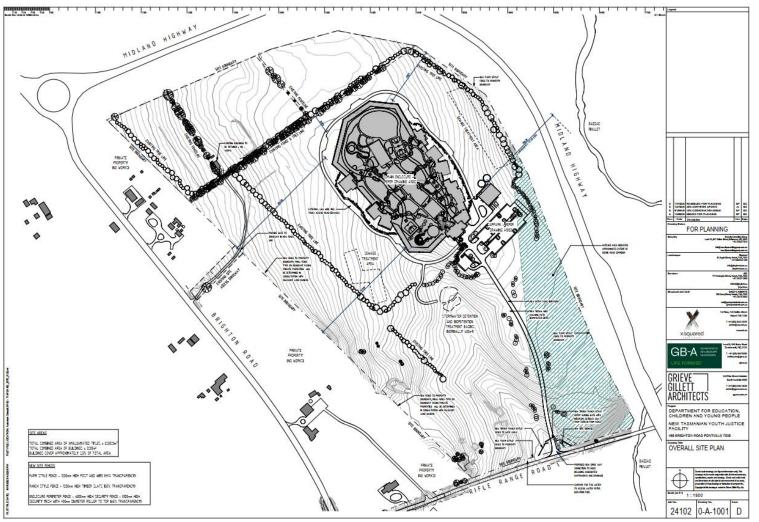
Overall site plan of the proposed development. (source Grieve Gillet Architects)
